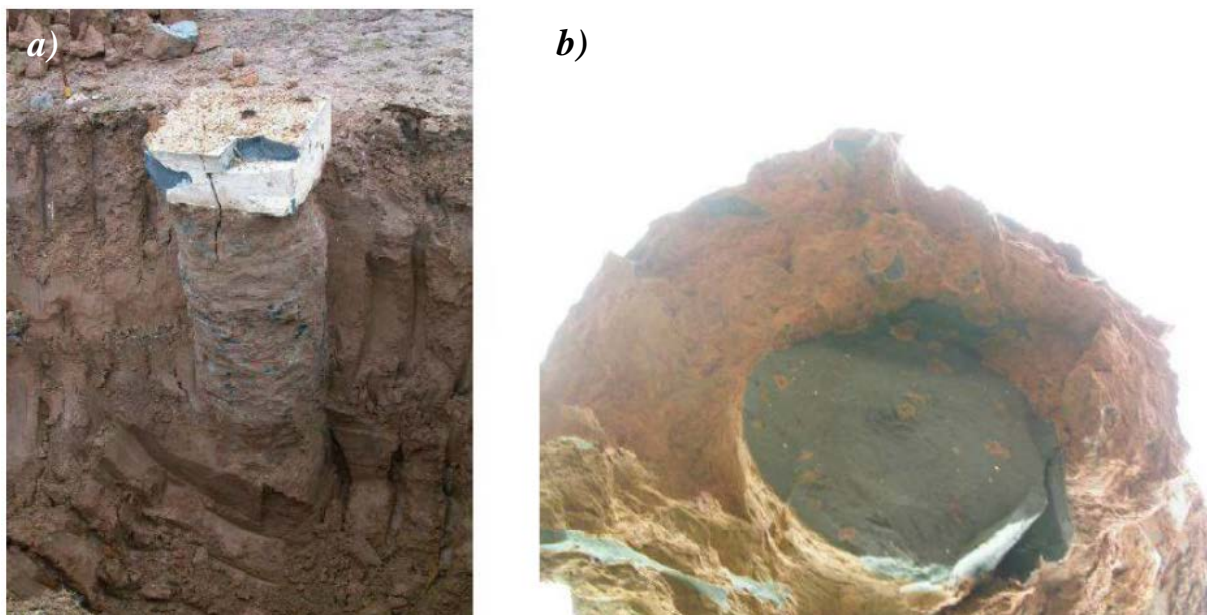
a) excavation of column P2 and b) view of the section of a similar (not loaded) column (Le Kouby, et al., 2010)
